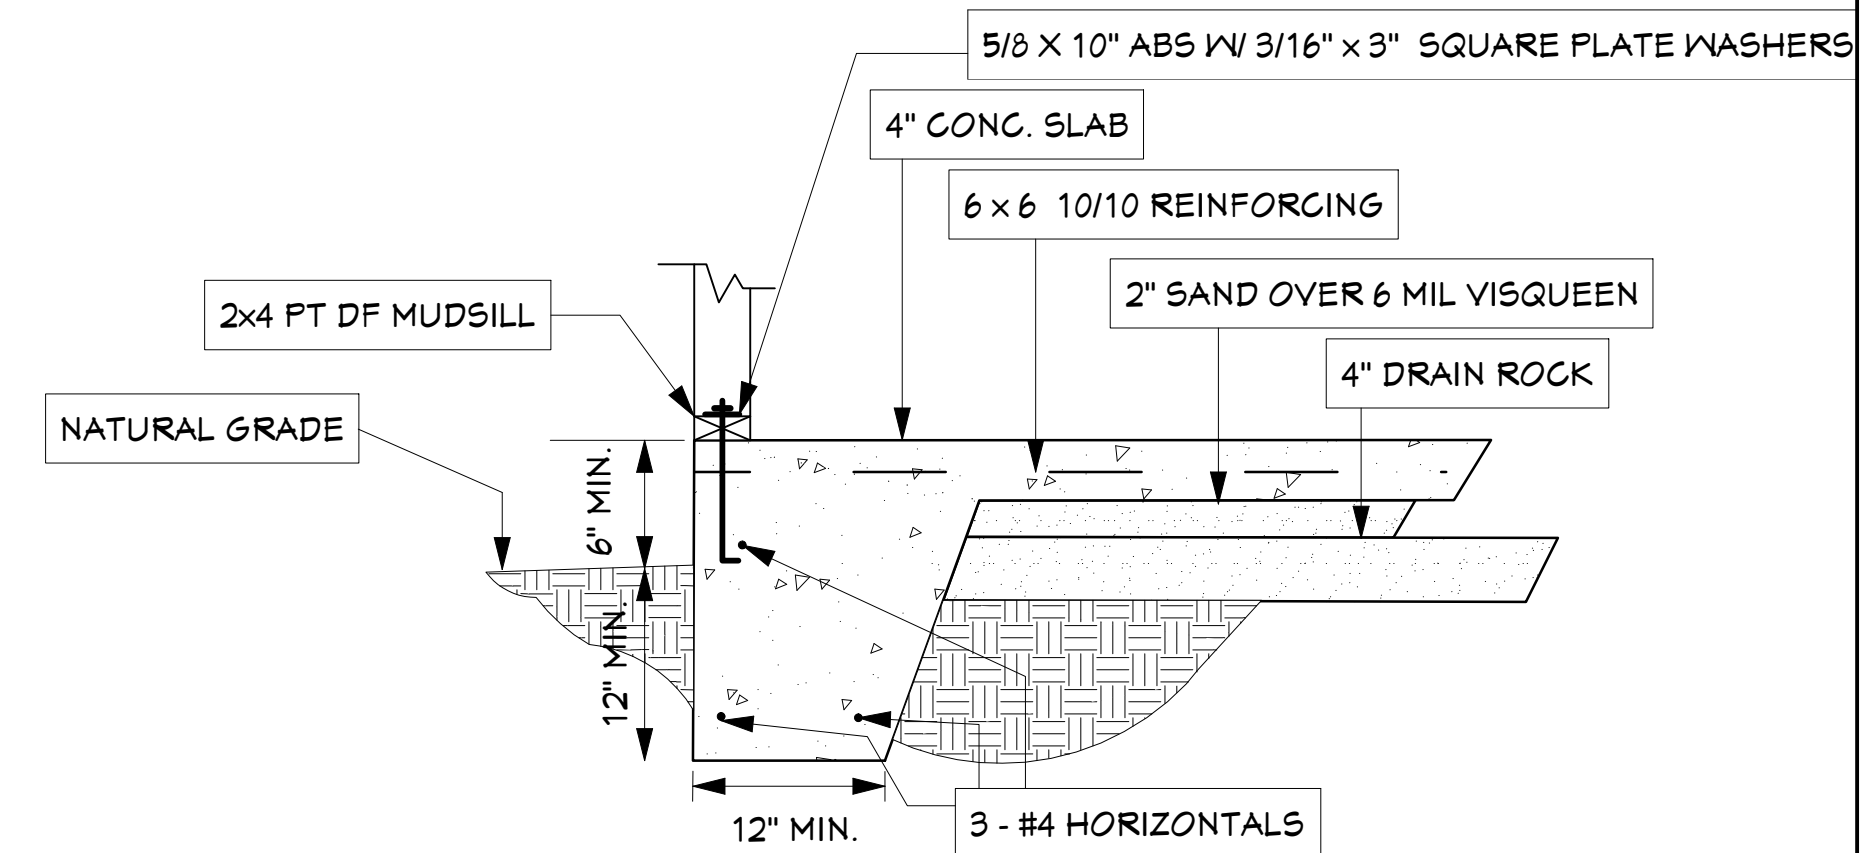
ONE-STORY GARAGE STEM WALL CURB & FOOTING
